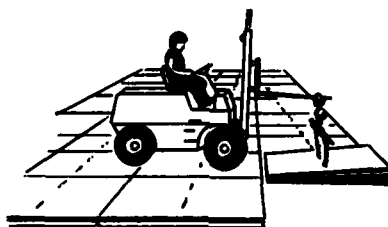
CONCRETE ELEMENT INSTALLATION
